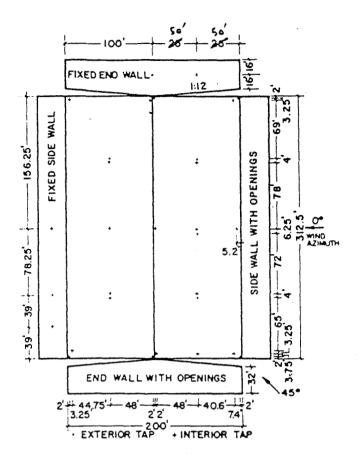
Exploded Plan View of the Large Model Showing the Position of Pressure Taps.
